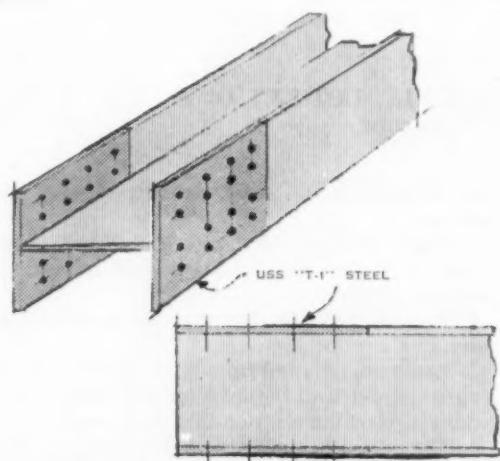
Tension joint detail, Benicia-Martinez Bridge
